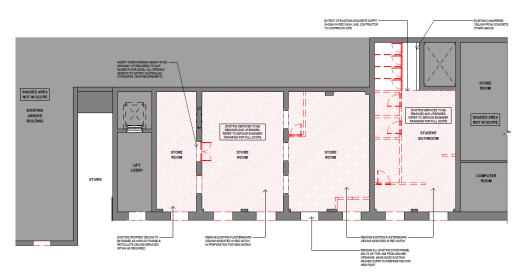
Existing / Demolition Plan. (Source: RFA Architects)
